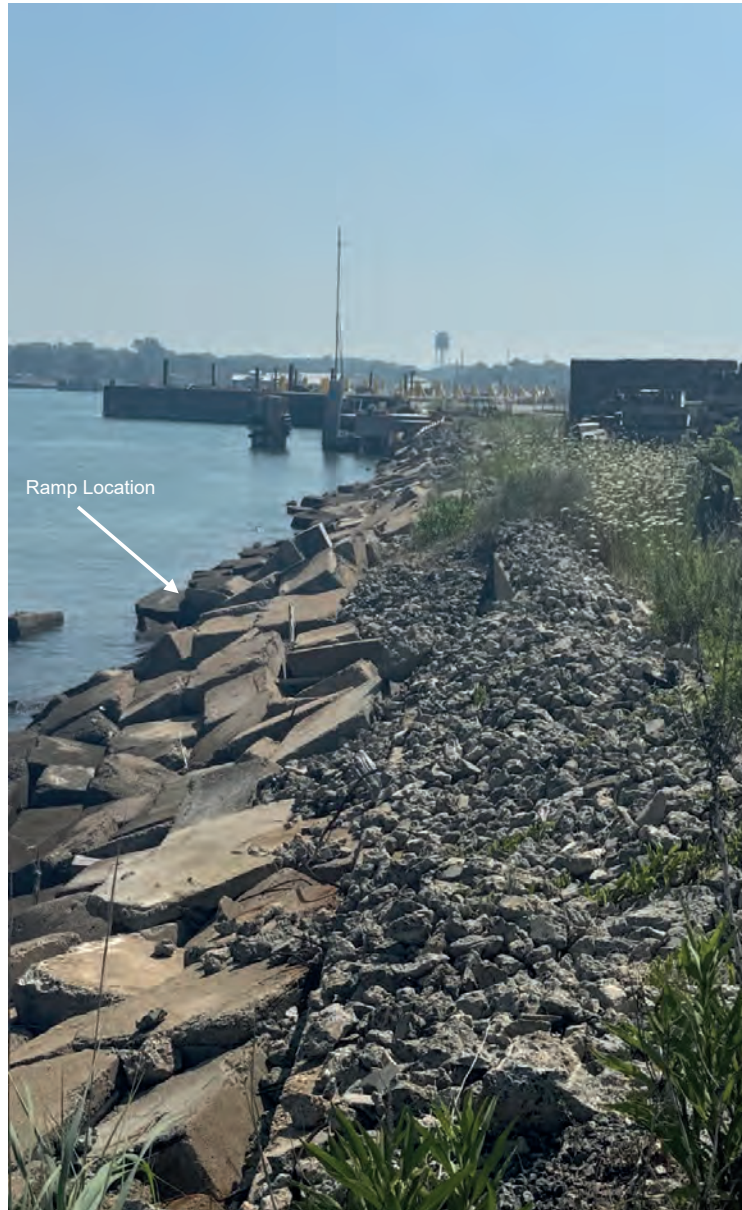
Looking east along northern shoreline where proposed launch ramp would enter the harbor.
